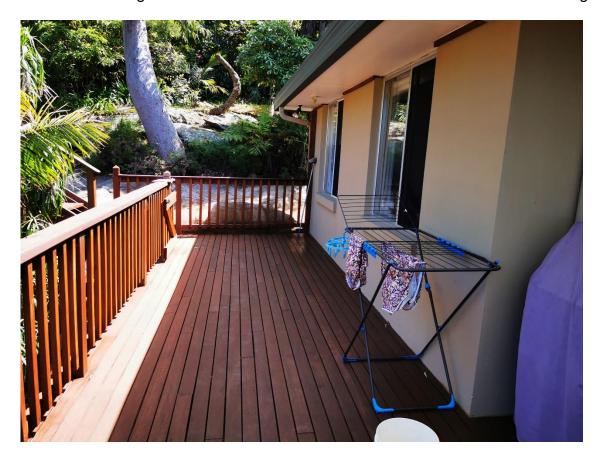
Showing rear timber Deck accessing stairs to Lower yard area and raised Gazebo Area.
